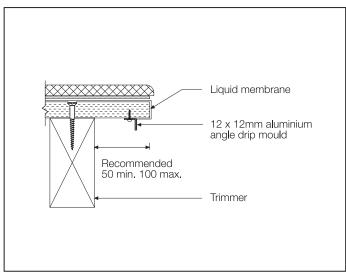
METHOD 2 - DECK EDGE DETAIL USING DRIP ANGLE
